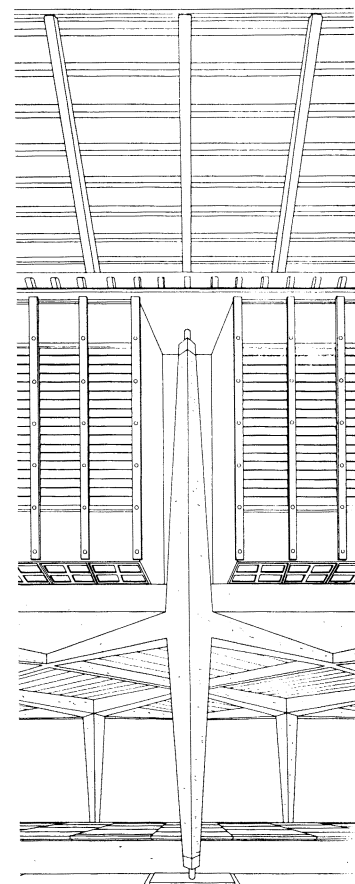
Weese, embassy, Accra. Detail of concrete column design with wooden jalousies and overhanging roof (Harry Weese & Associates Architects).
